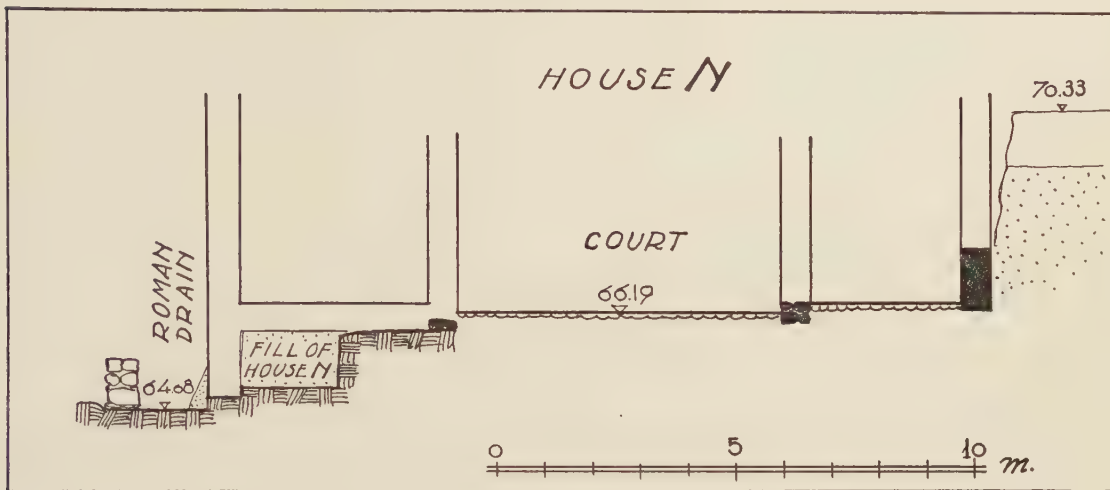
East-West Section through Roman Drain and West Foundation of House N, Looking North.
